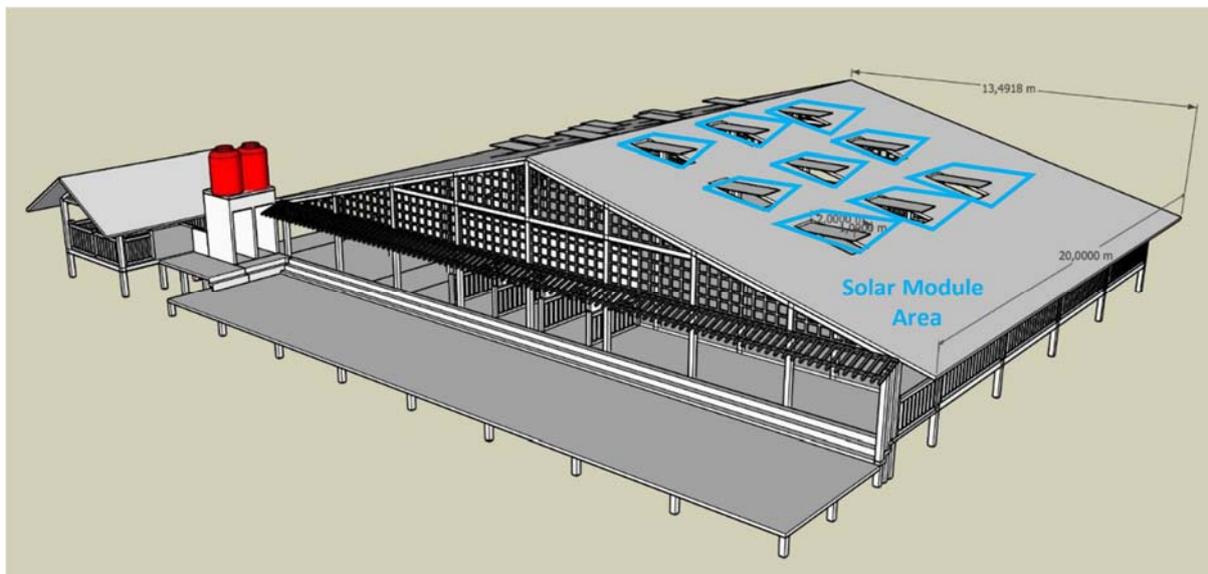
Overview of the multipurpose building with an off-grid solar system (17 solar panels) installed on the roof
